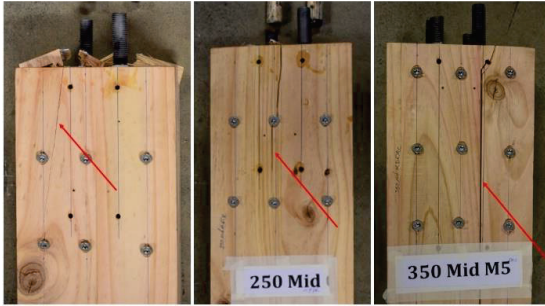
Surface crack of specimens containing rods on the boundary of two cross-wise layers.
